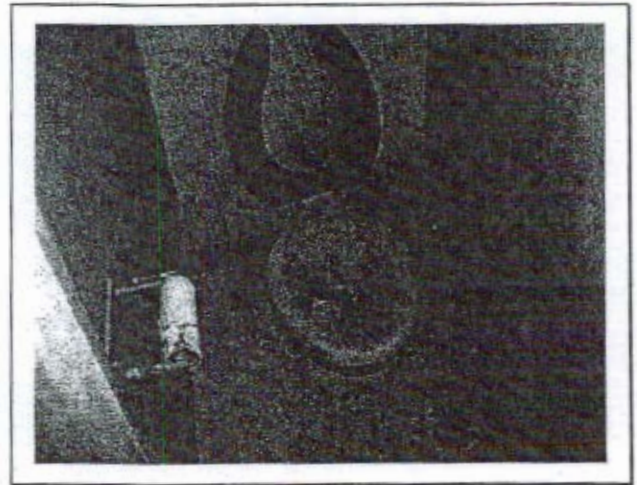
Viewing white toilet, Throughout restrooms.
